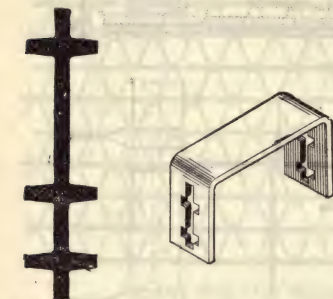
Roebling Flat Concrete Floor-construction. Type 5
